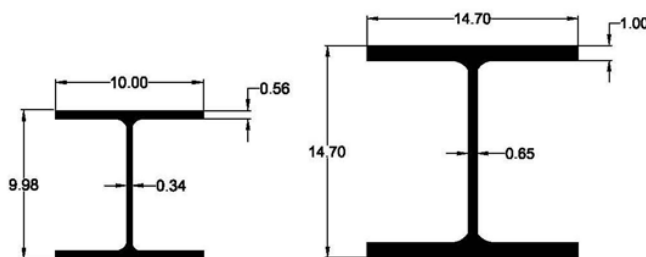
W10x49 (left) and W14x132 (right) Cross-Sectional Dimensions
